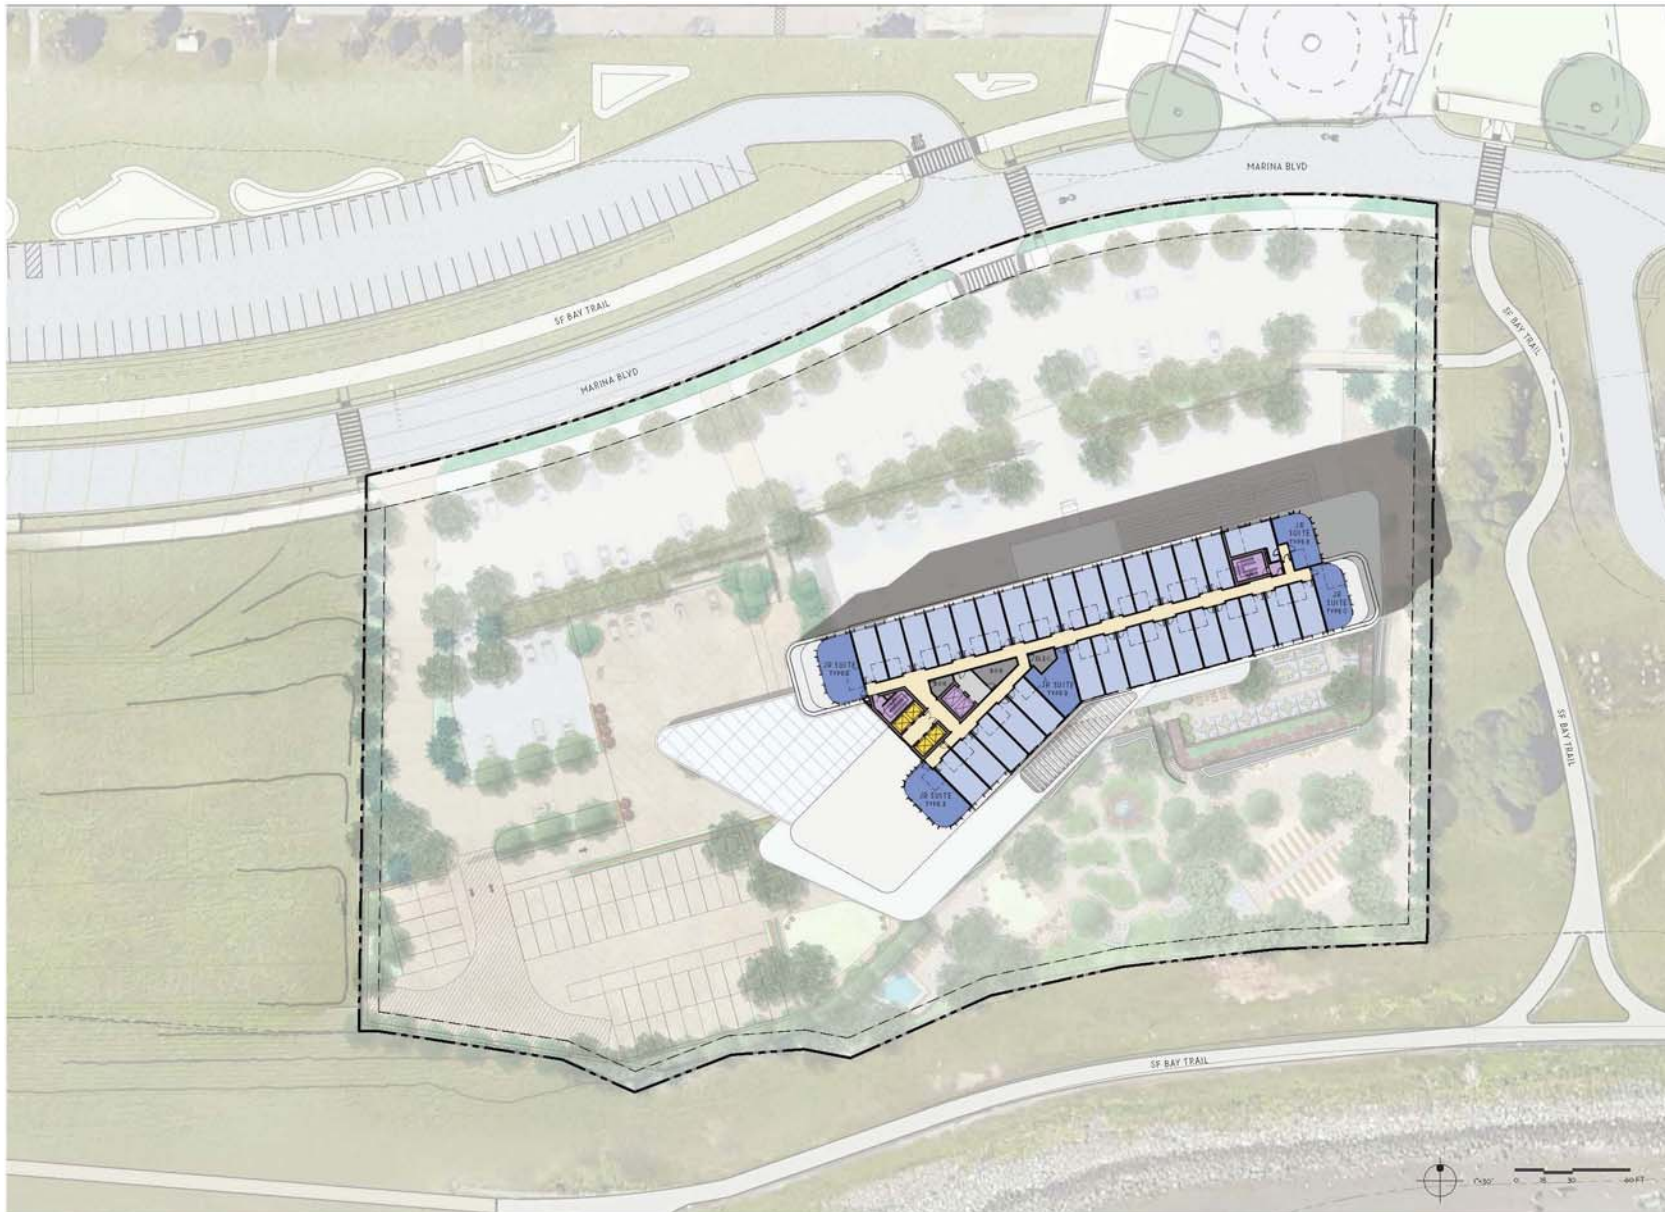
Floor Plan, Floors 9 through 11 (these floors would have substantially similar floor plans)
